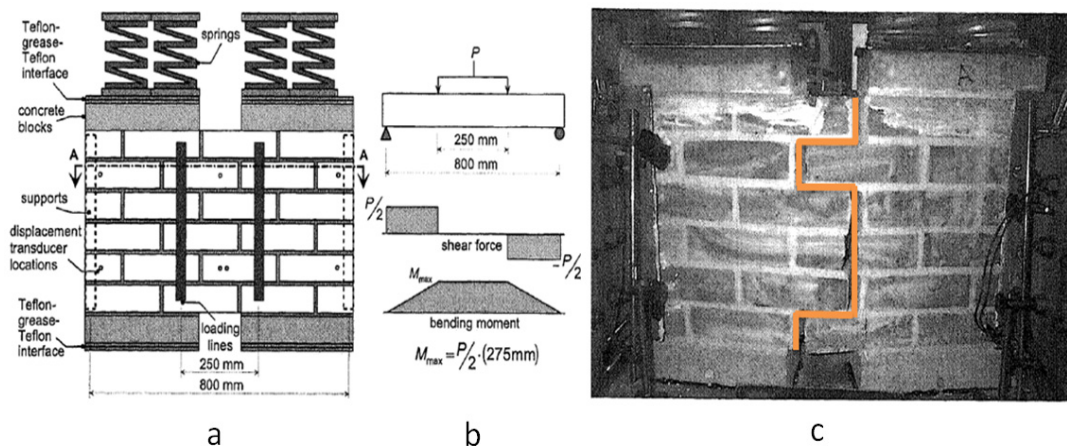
a: Horizontal bending test device; b: loading configuration; c: front elevation view of horizontal bending test specimen and highlight of crack pattern (picture from [6])
